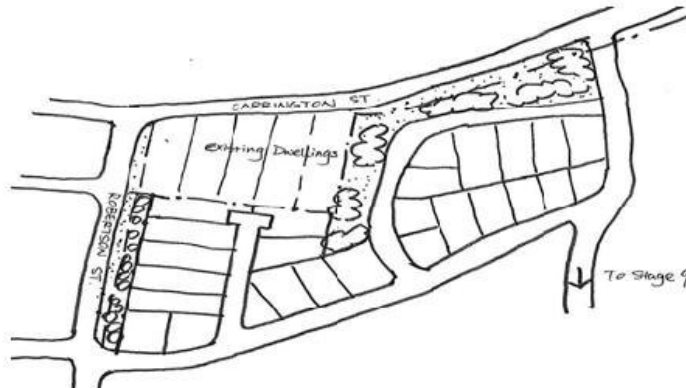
Council's Landscape Officer Recommended Layout of Subdivision near the Carrington Street entrance to the town.
